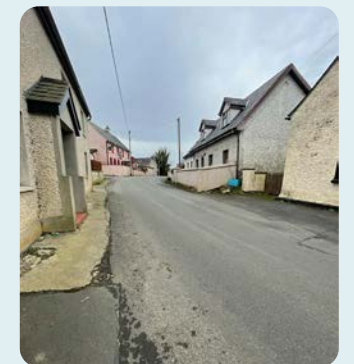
Poor existing Footpath Arrangement at Kilmacow Lower
